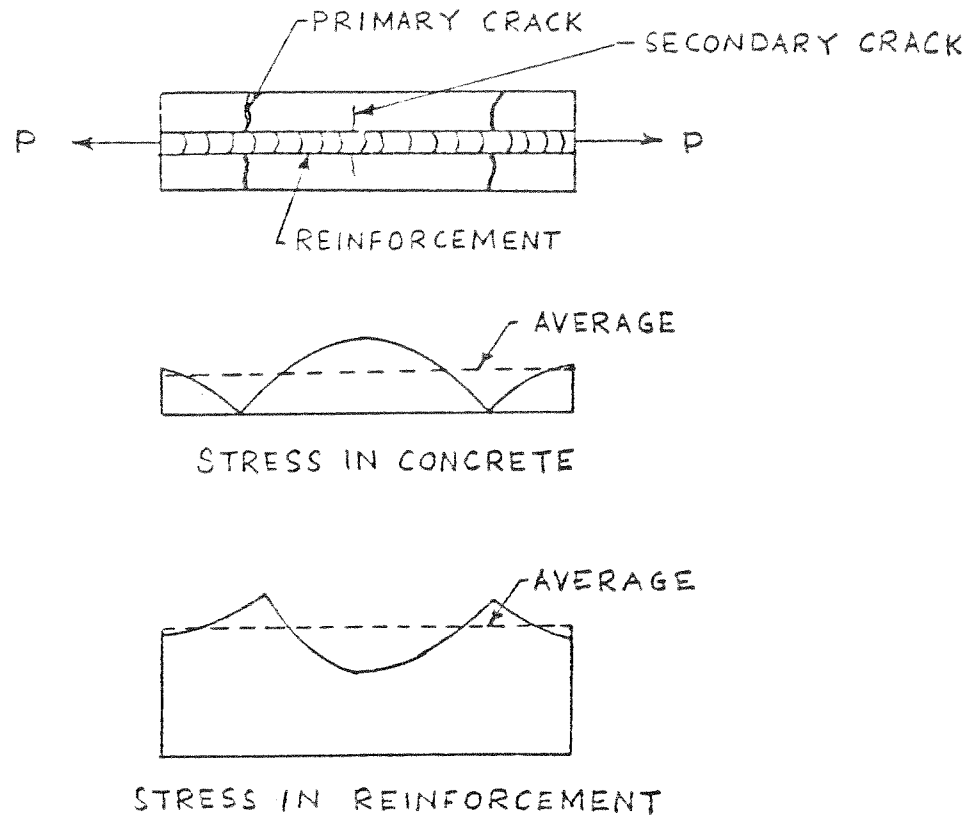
STRESS DISTRIBUTION IN A CRACKED REINFORCED CONCRETE ELEMENT
